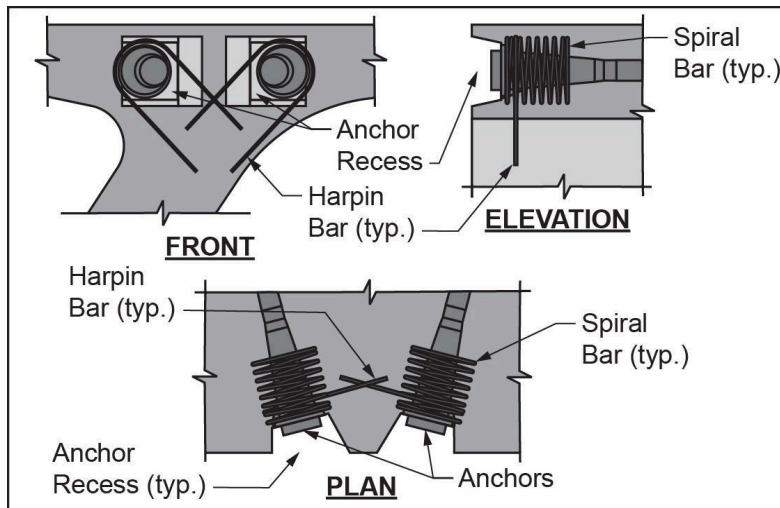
Reinforcing Steel at Post-Tensioning Anchors
